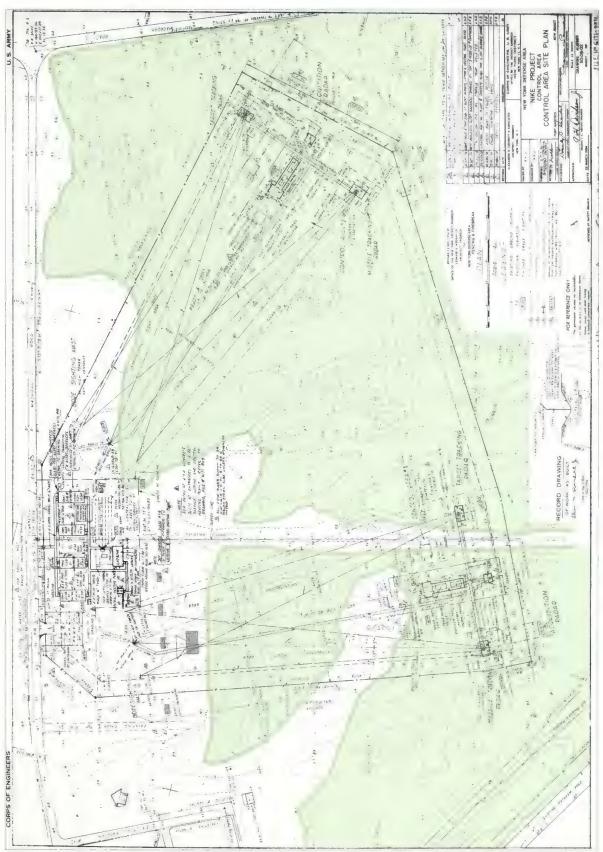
"NIKE" Project, Control Area Site Plan, 1954. In the proposed layout of the NIKE radar site, six concrete foundations (shaded gray) lack building descriptions and appear small enough to be outbuildings or auxiliary structures. The plan also shows vegetation cover (shaded green) occupying more than half of the proposed area and labeled "brush and trees up to 35' high" (GATE 11052 and Olmsted Center).
